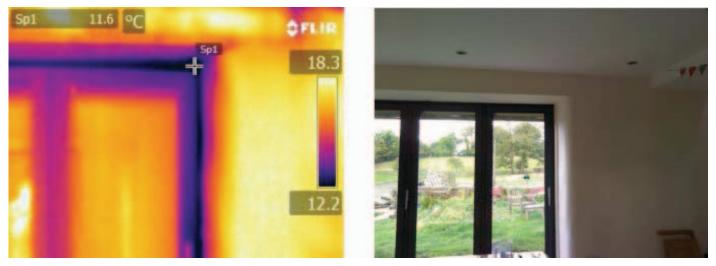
White House Farm, Stirton, Skipton D north wall in kitchen showing ingress around new door casement
